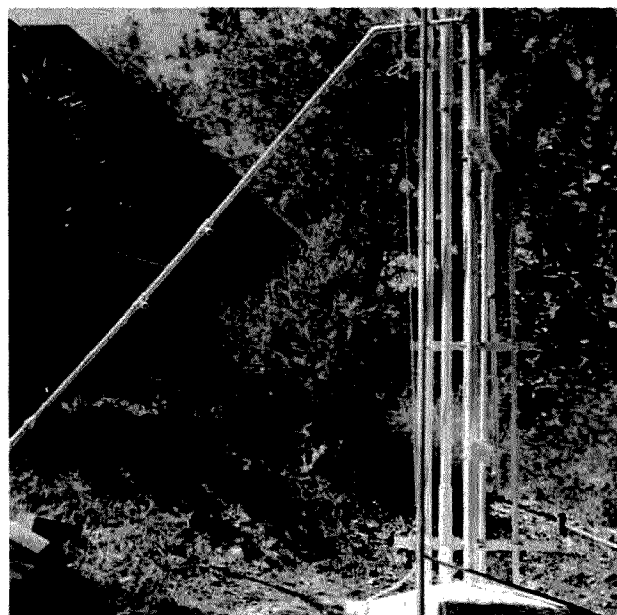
Photo C. Lower section of tower showing construction. The tower has two braces (1/2" pipe) attached 8 feet above ground. The lower cage section extends upward 20 feet above the concrete base.
